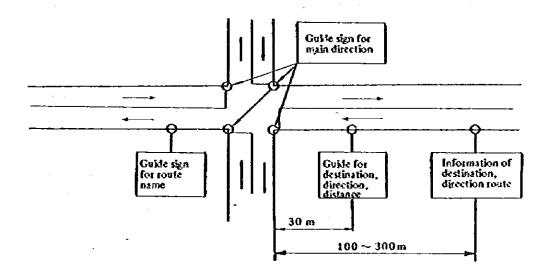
Typical Locations of Guide Sign Installation
